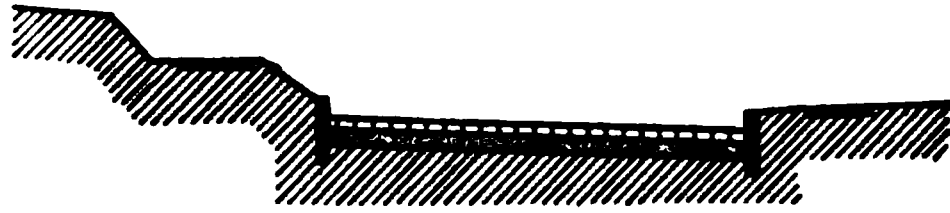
CROSS SECTION OF STREET ON A SIDE HILL.
